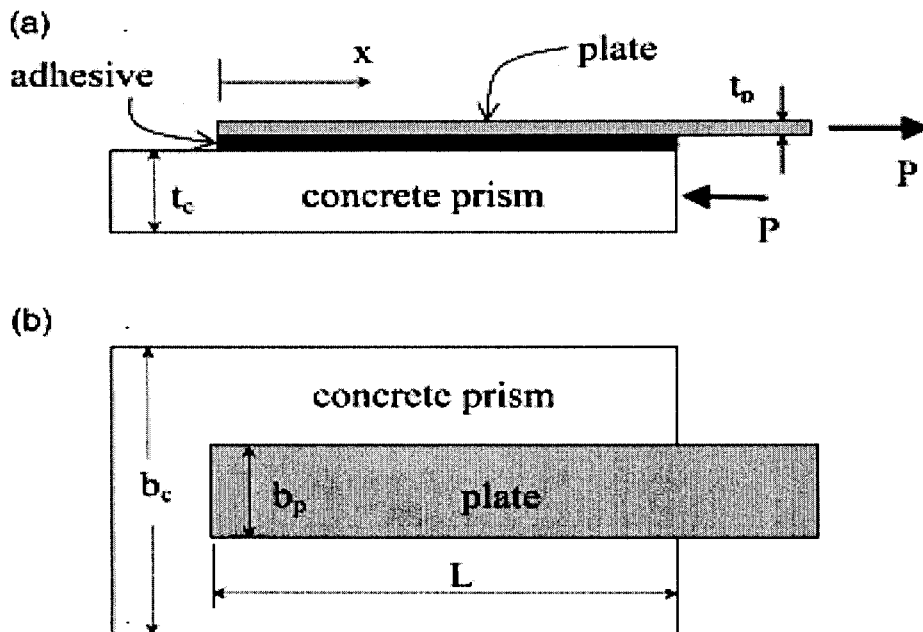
Pull-push shear test of a single-lap plate-to-concrete bonded joint: (a) elevation; (b) plan (Yuan et al. 2004)
